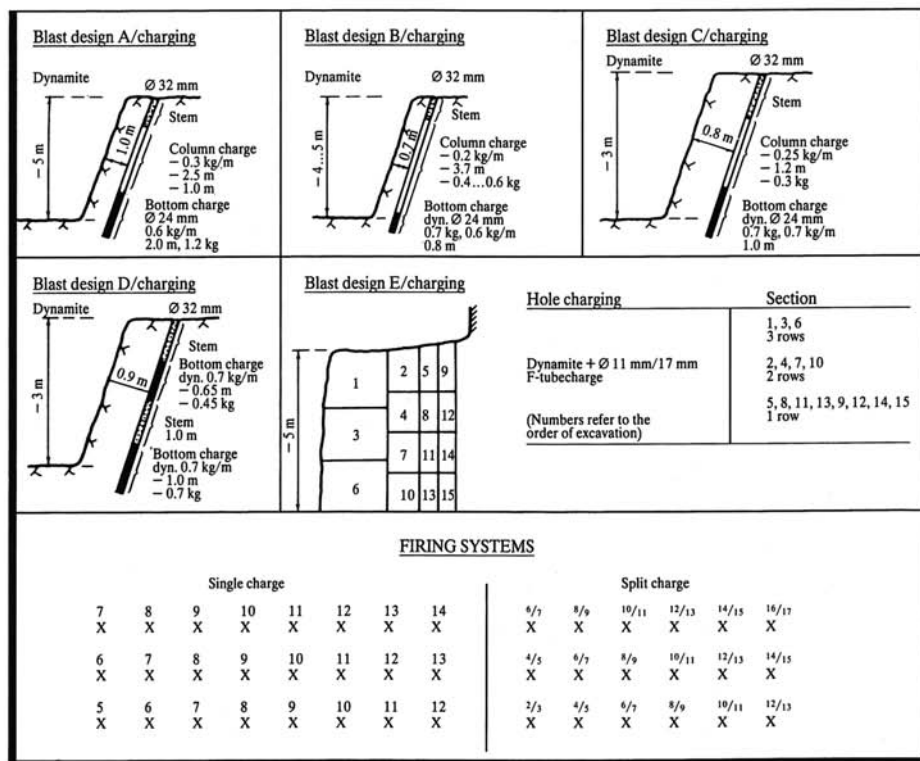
11. A plan for rock excavation close to a building.
